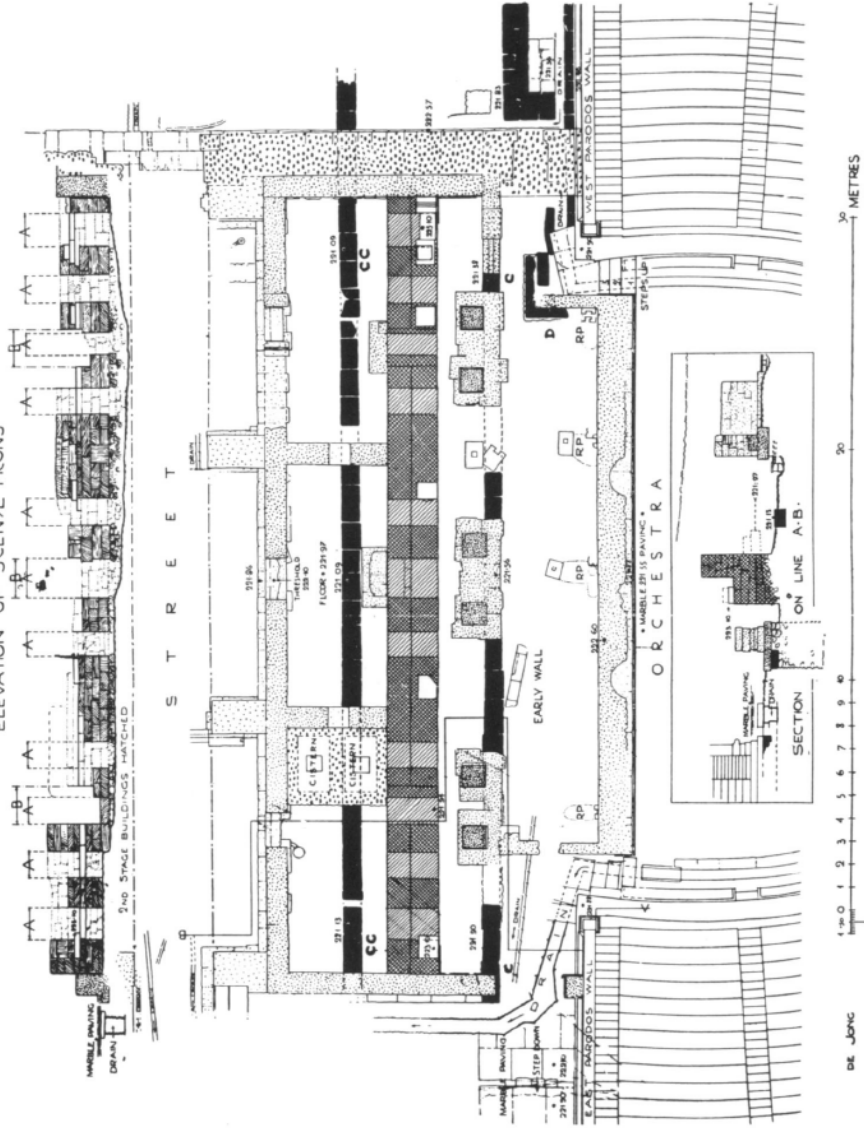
Plan of stage-building of Sparta theatre by P. de Jong, 1926.
